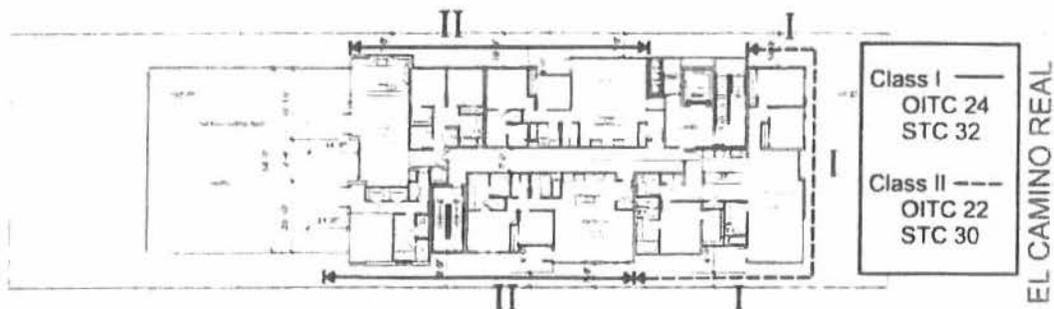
C: *Minimum recommended glazing ratings for Floor 3, Floor 4, and Floor 5
